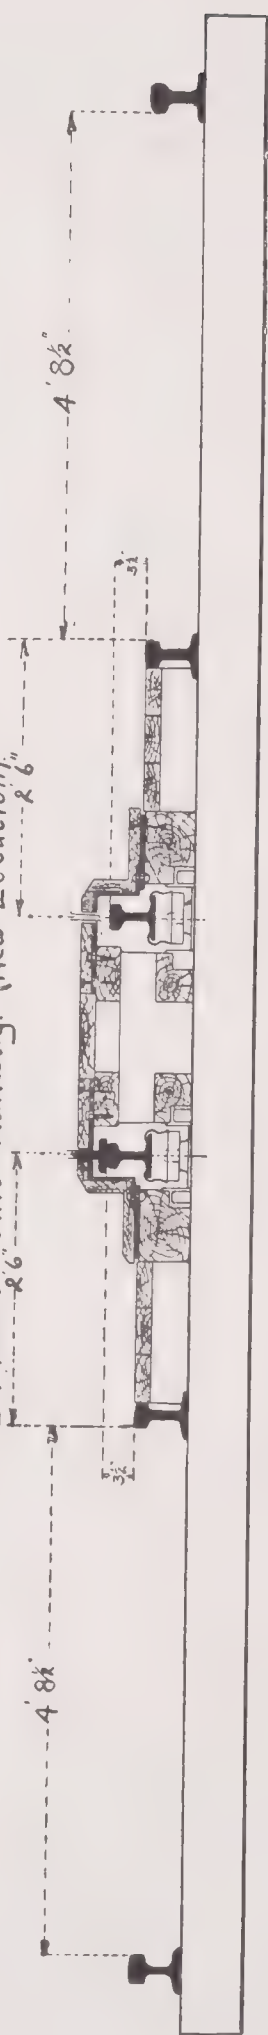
SECTIONS OF DOUBLE TRACK ON VARIOUS RAILWAYS.
